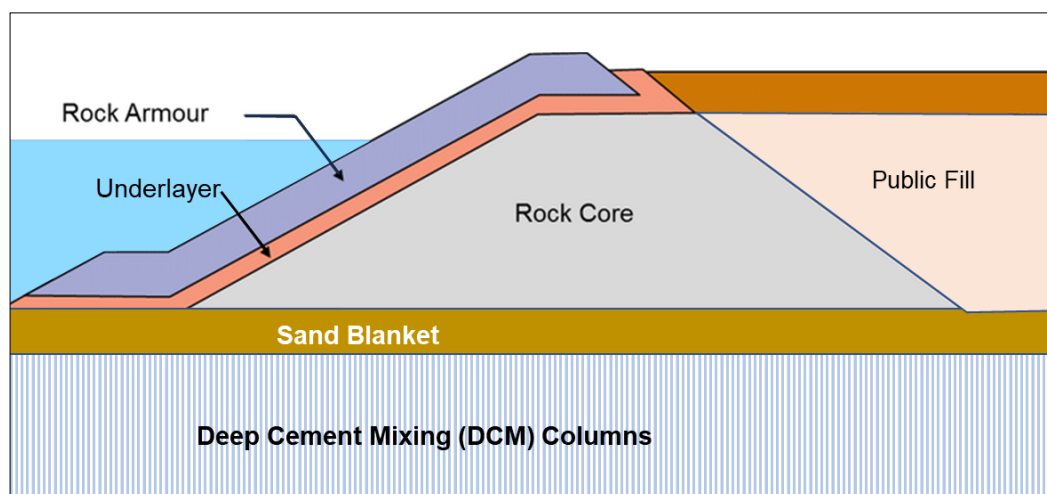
Typical Cross Section of Non-dredged Reclamation (Sloping Seawall)
